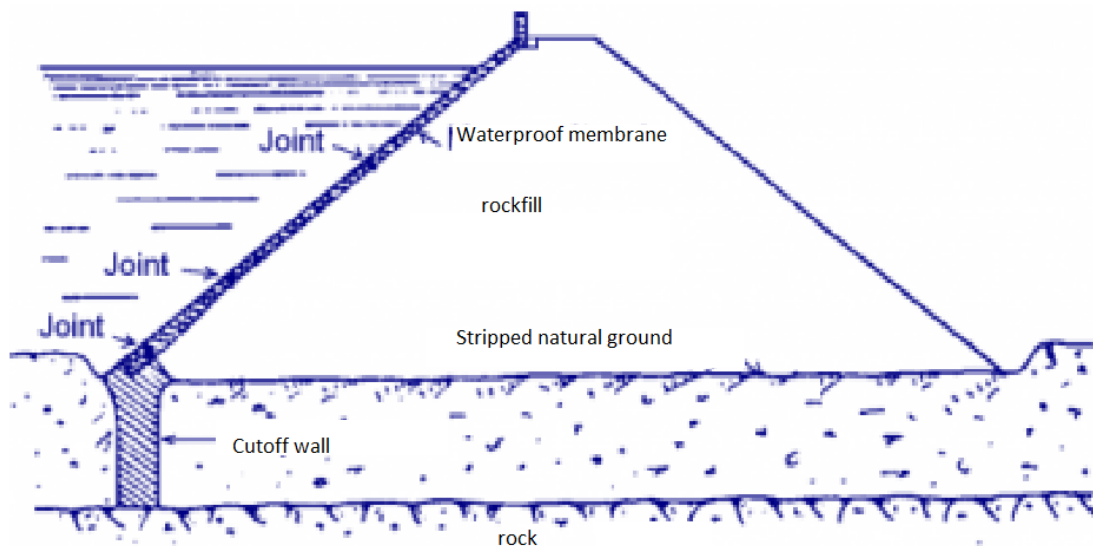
Molded wall foundation waterproofing (Ouandjeli, 2018)
